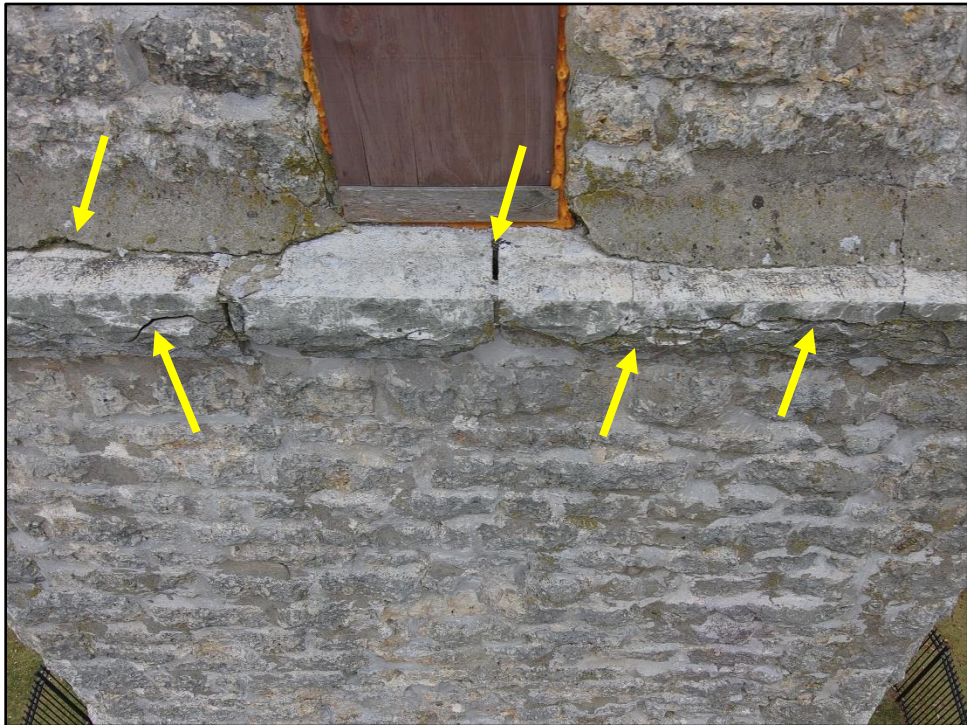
Cracked stones, missing mortar, deteriorating mortar wash
